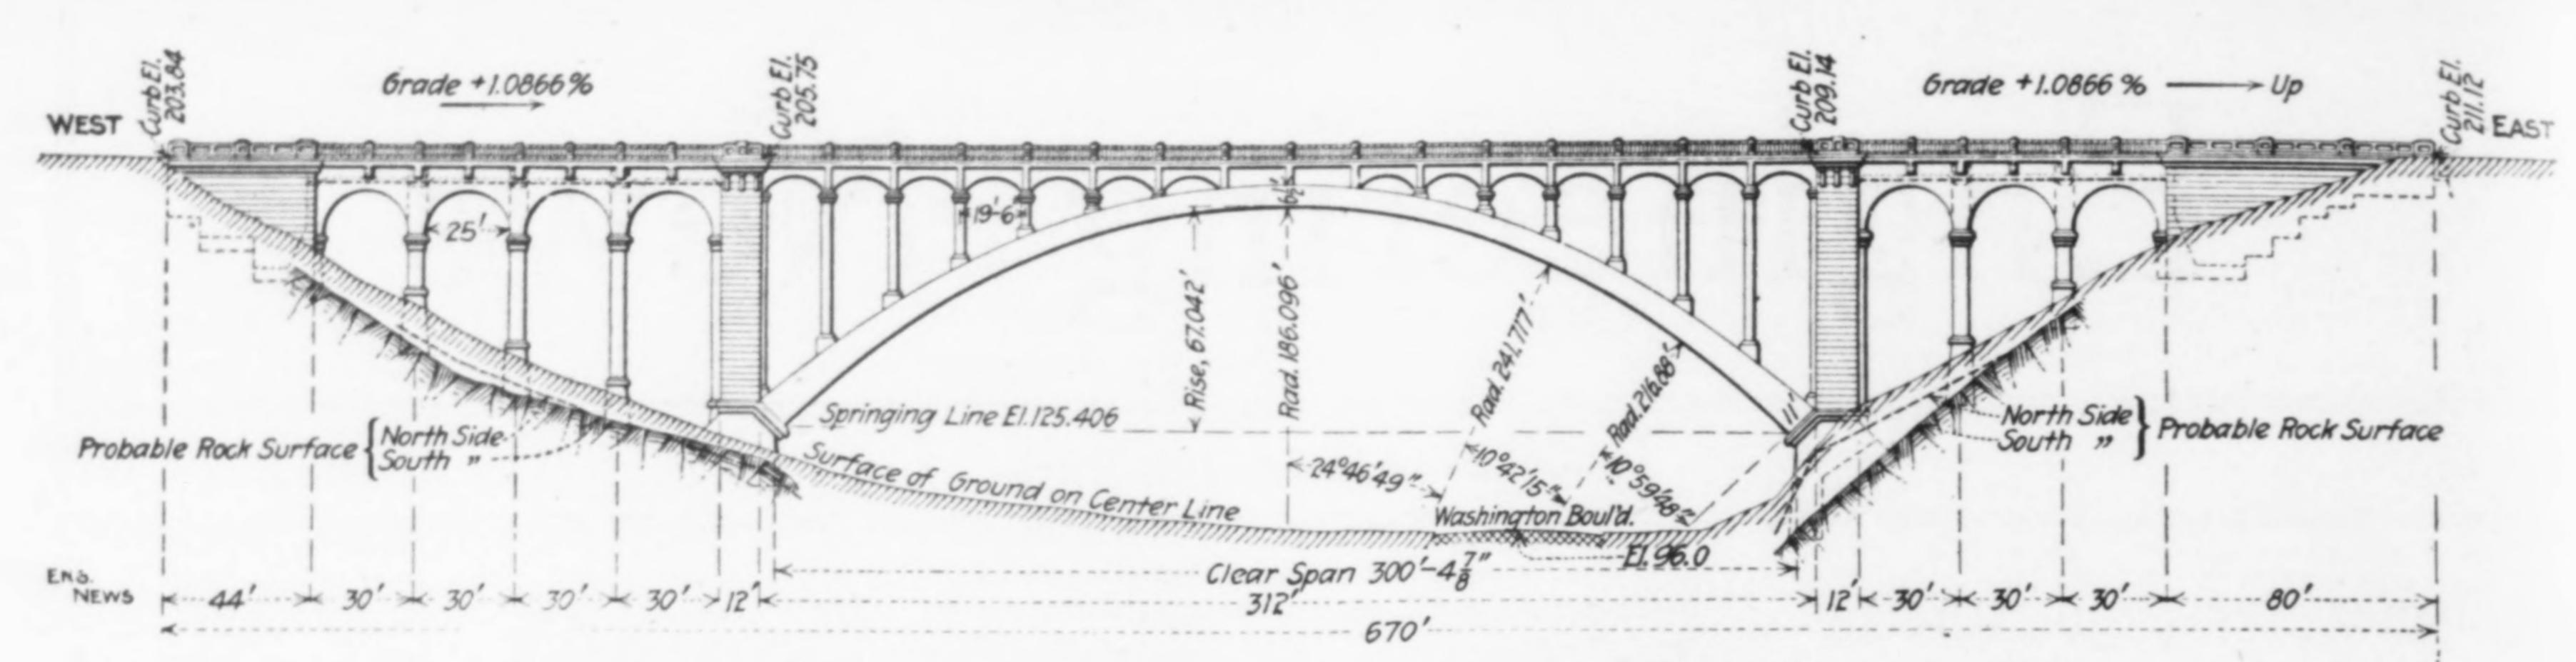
GENERAL ELEVATION OF LARIMER AVE. ARCH BRIDGE, PITTSBURGH, PENN.
